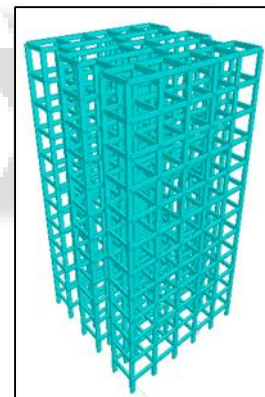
Elevation of G+10 storey building using unbraced and without shear wall
